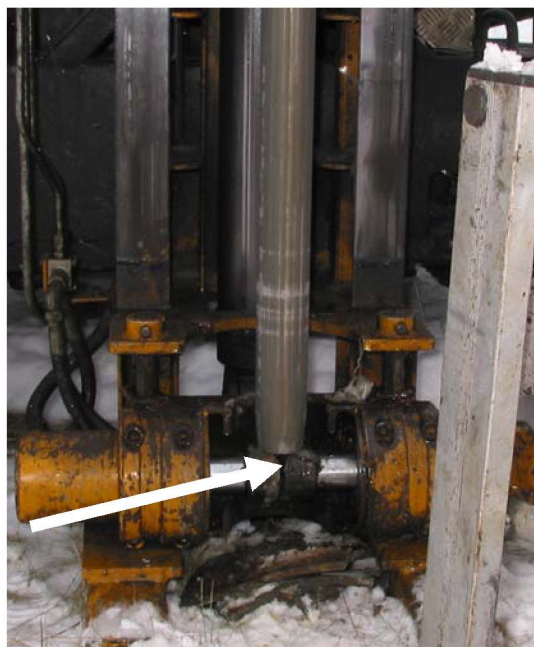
Sampler with slender cutting edge resting on the bottom clamps.
